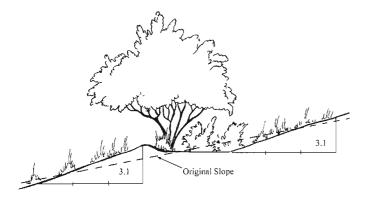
A terrace without retaining walls. Such a strategy can be used on gradual slopes less than 3:1, 18°, 32.5%. However, care must be taken to ensure that the steeper slopes, created between the terraces by their construction, will not exceed a 3:1 slope; otherwise retaining walls will need to be constructed to stabilize the slope and structure.
